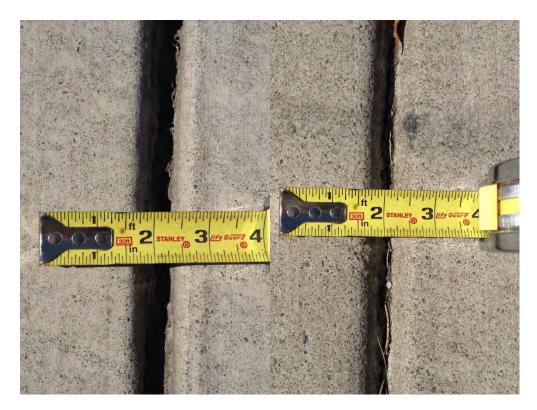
Typical extension cracks in thermal joints of sidewalk pavement parallel to fault; ~13mm gap (left), ~7mm gap (right) [NSF-GEER; N 38.3067 W 122.3464; 8/28/2014 15:18]
